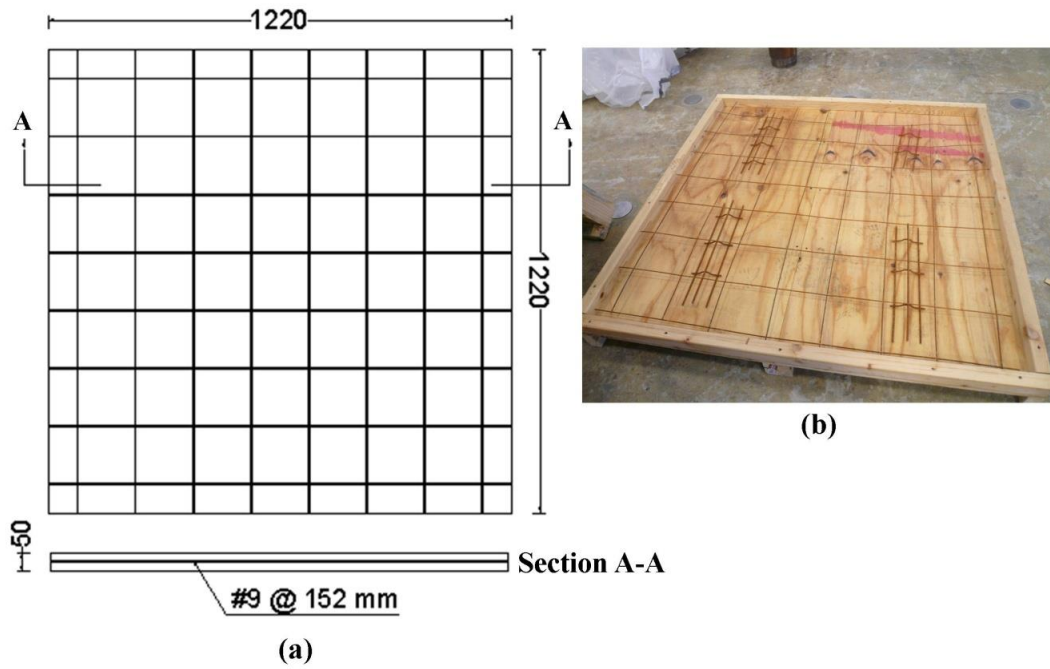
Details of WWR Concrete Panels (a) Cross Section of Panels; and (b) Reinforcement Layout of Panels (Unit: mm)
